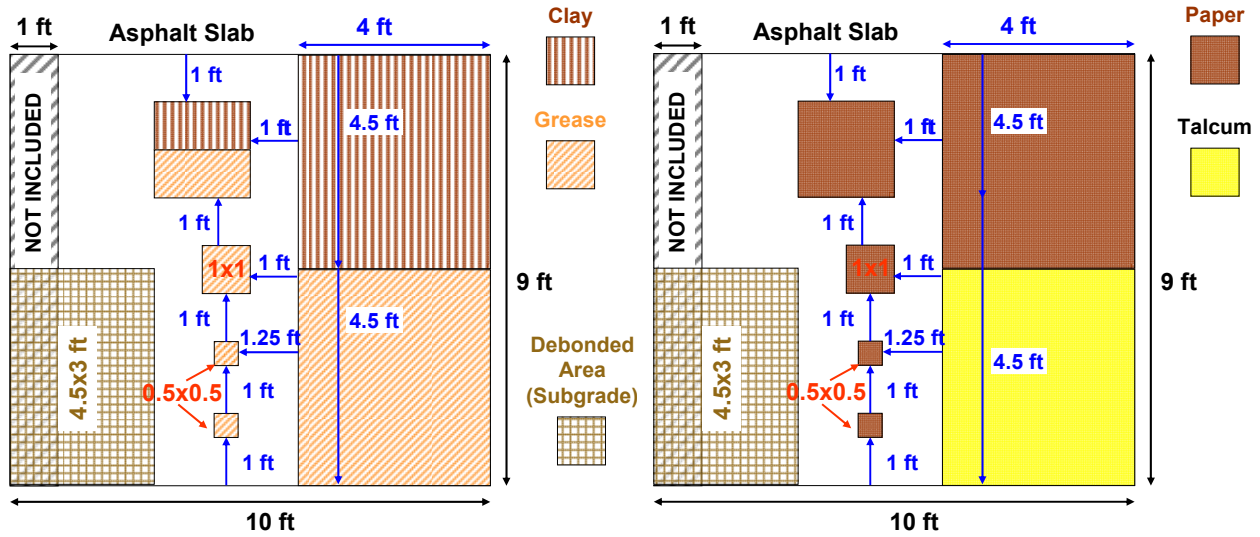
Layout of Delamination on Coarse Mix Sections
